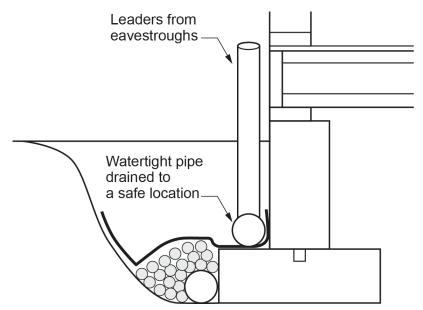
Dedicated footing and roof drainage piping systems. (Skilled Trades BC, 2021) Used with permission.
